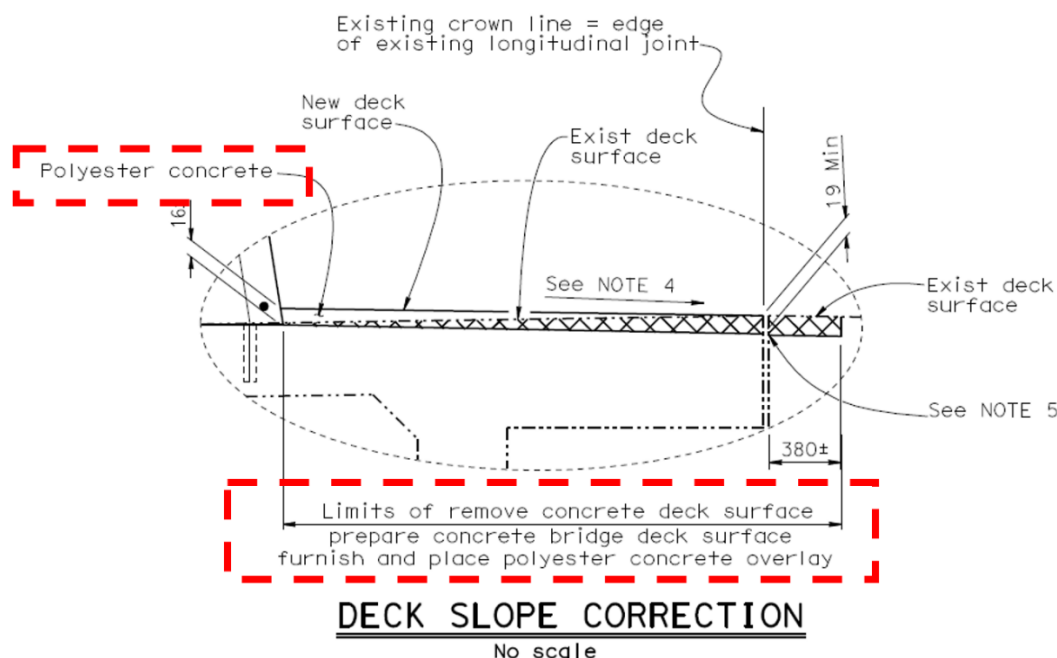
Polyester Concrete Overlay Used to Correct the Bridge Deck Cross Slope
